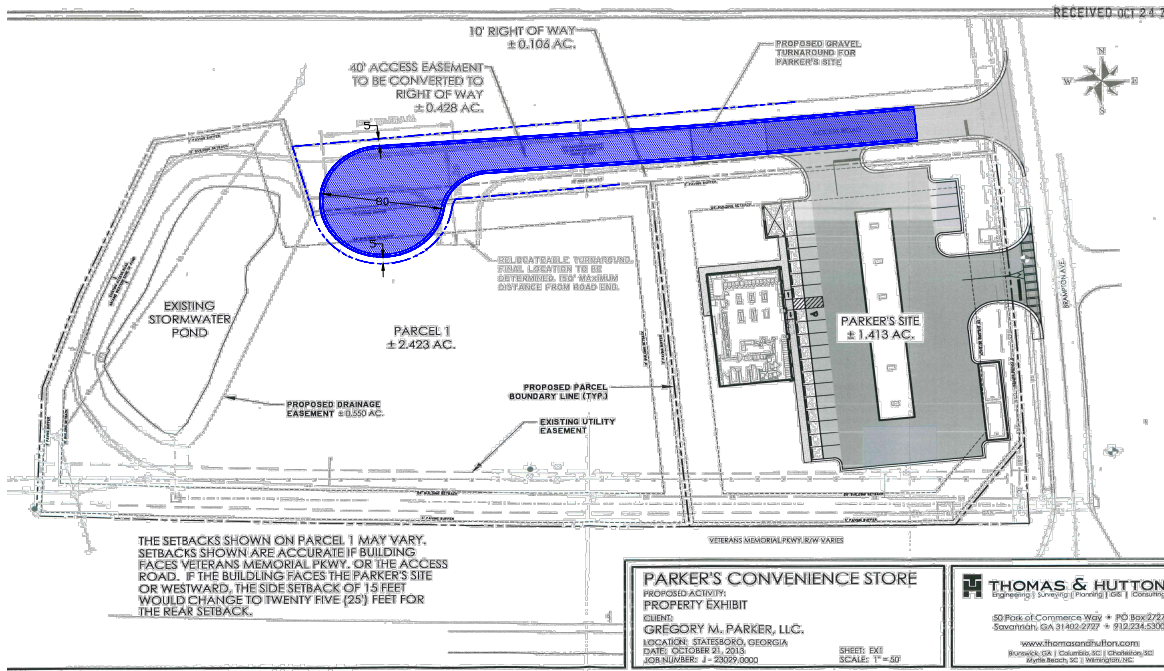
EXHIBIT C: SKETCH PLAN SUBMITTED BY APPLICANT
